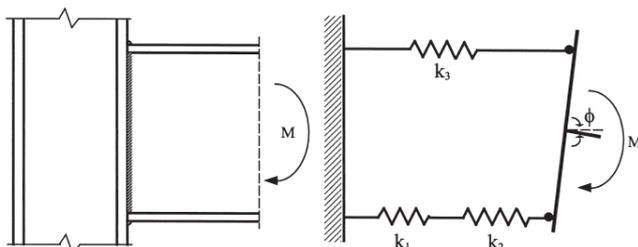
Welded beam to column joint – mechanical model, /3/.
